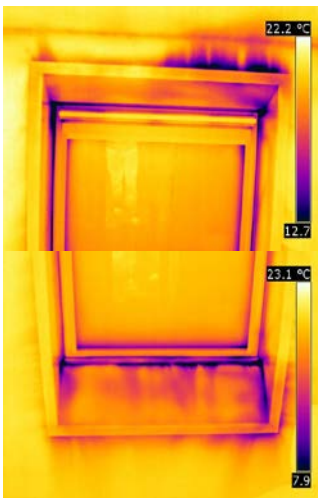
Thermo image of a window in an inclined wall and leakage of airtight barrier (Blower-door test by Lars Due, 2009)
